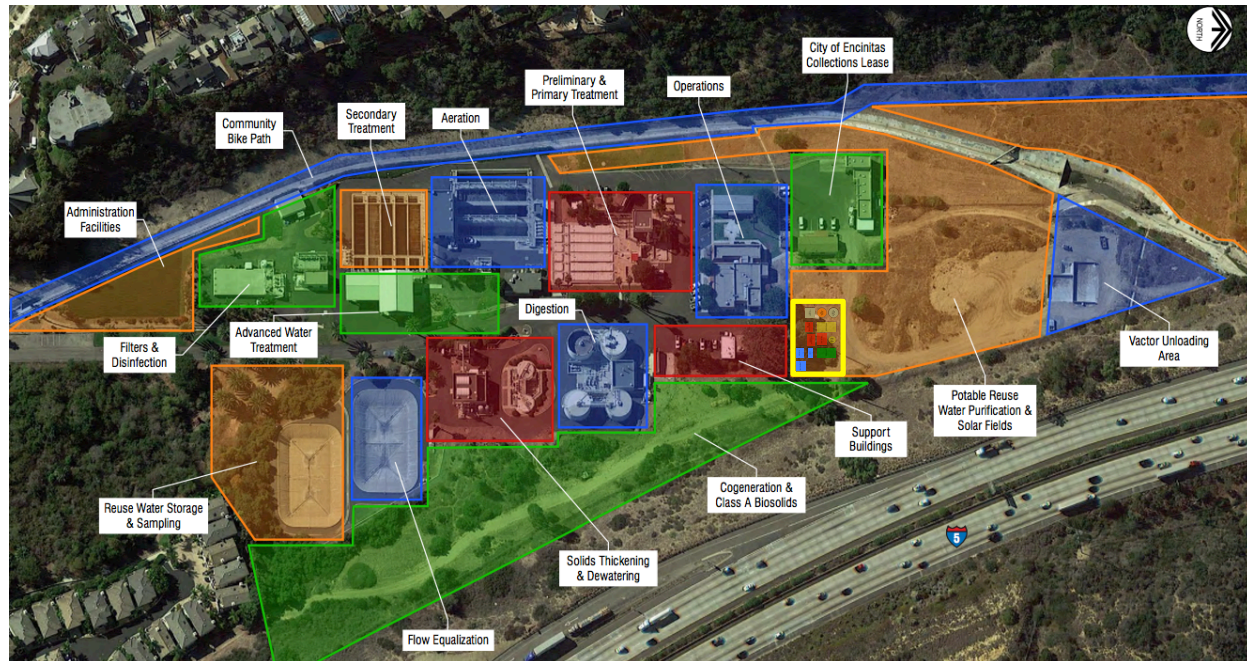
Site layout for potable reuse system at SEWRF. Yellow box shows layout of new facilities described in Figure 2.4.
